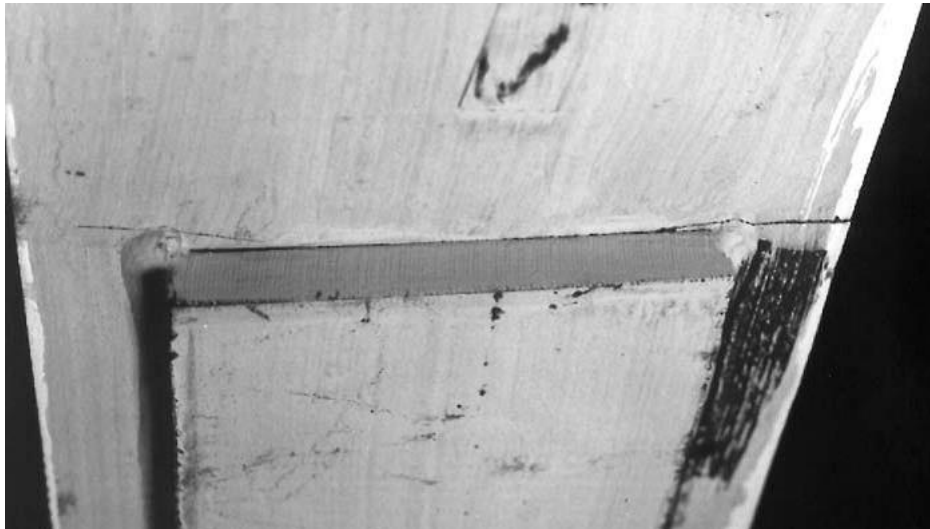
Fatigue crack at end of cover plate fillet weld toe.
